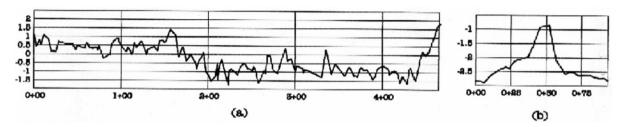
Submerged jetty: (a) centerline and (b) cross-section; stations and elevations in m.
